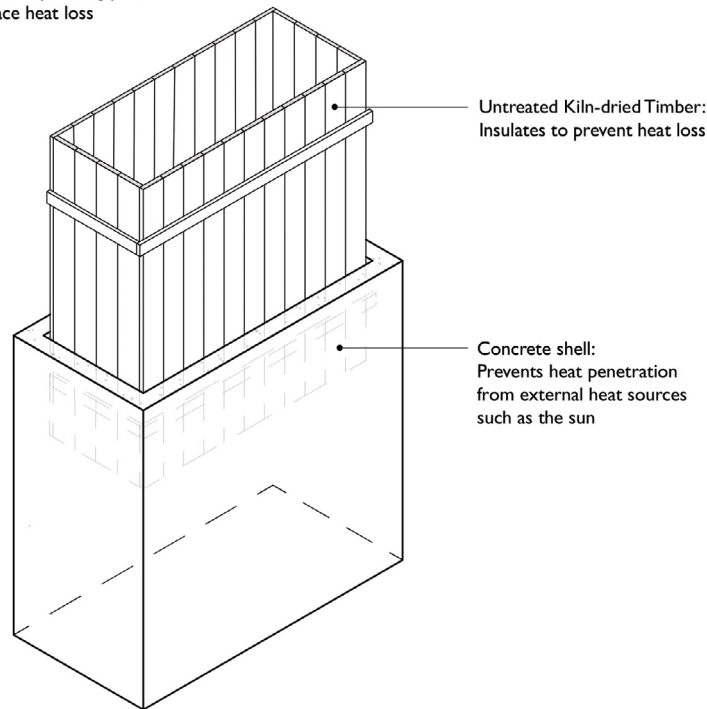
Proposed constructed composting chamber's materiality and shape (Author 2015).
